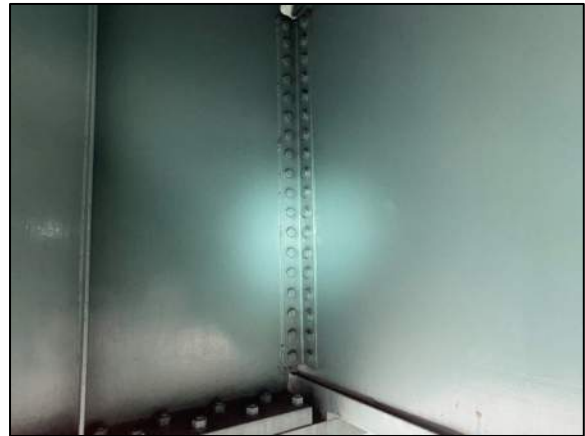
Typical Tack Welds Along Bolted Connection Between Girder C and Pier Cap Webs
